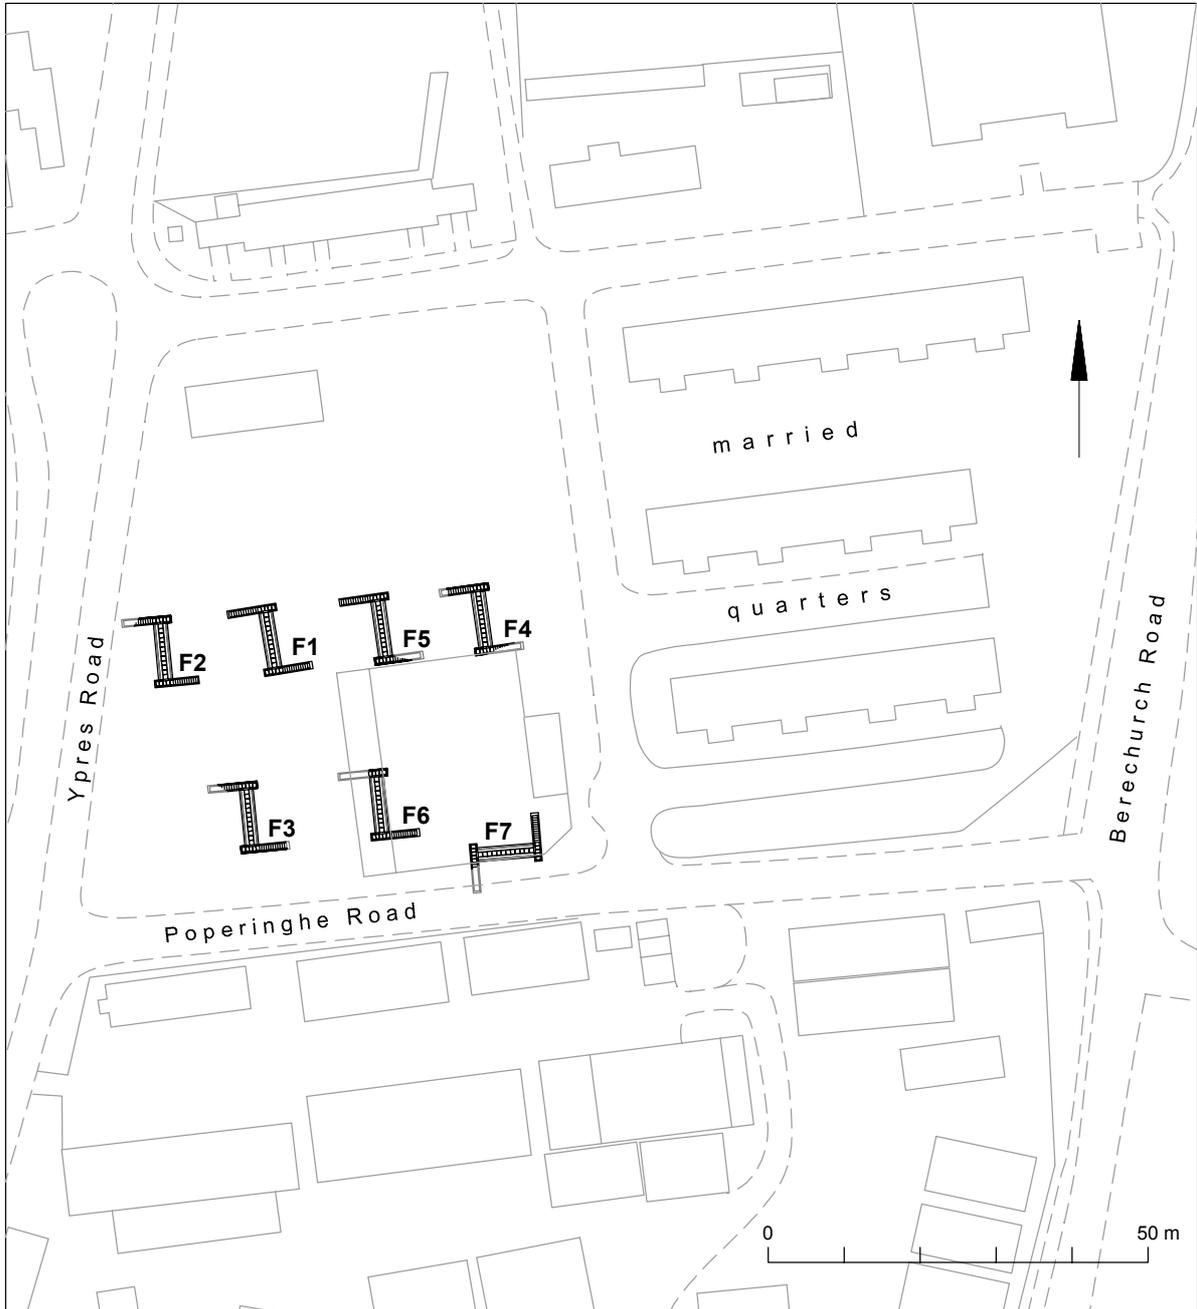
Plan of Area J1, showing air-raid shelters and contemporary barrack buildings.
